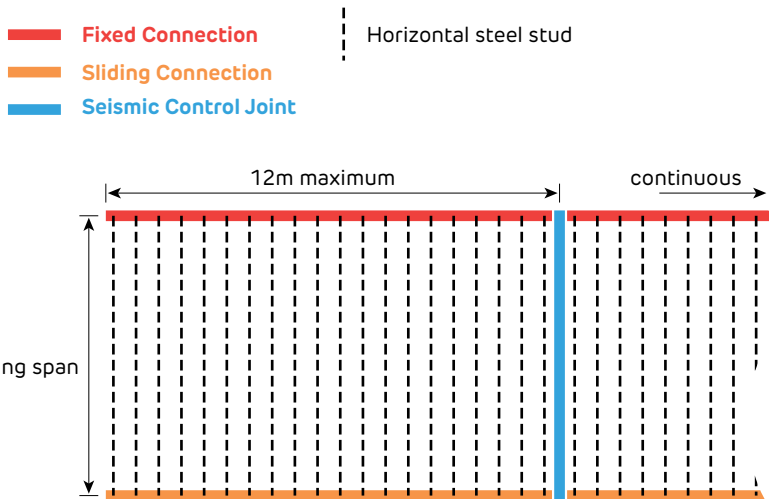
Stud Ceiling Type A1 - Fixed / Sliding
